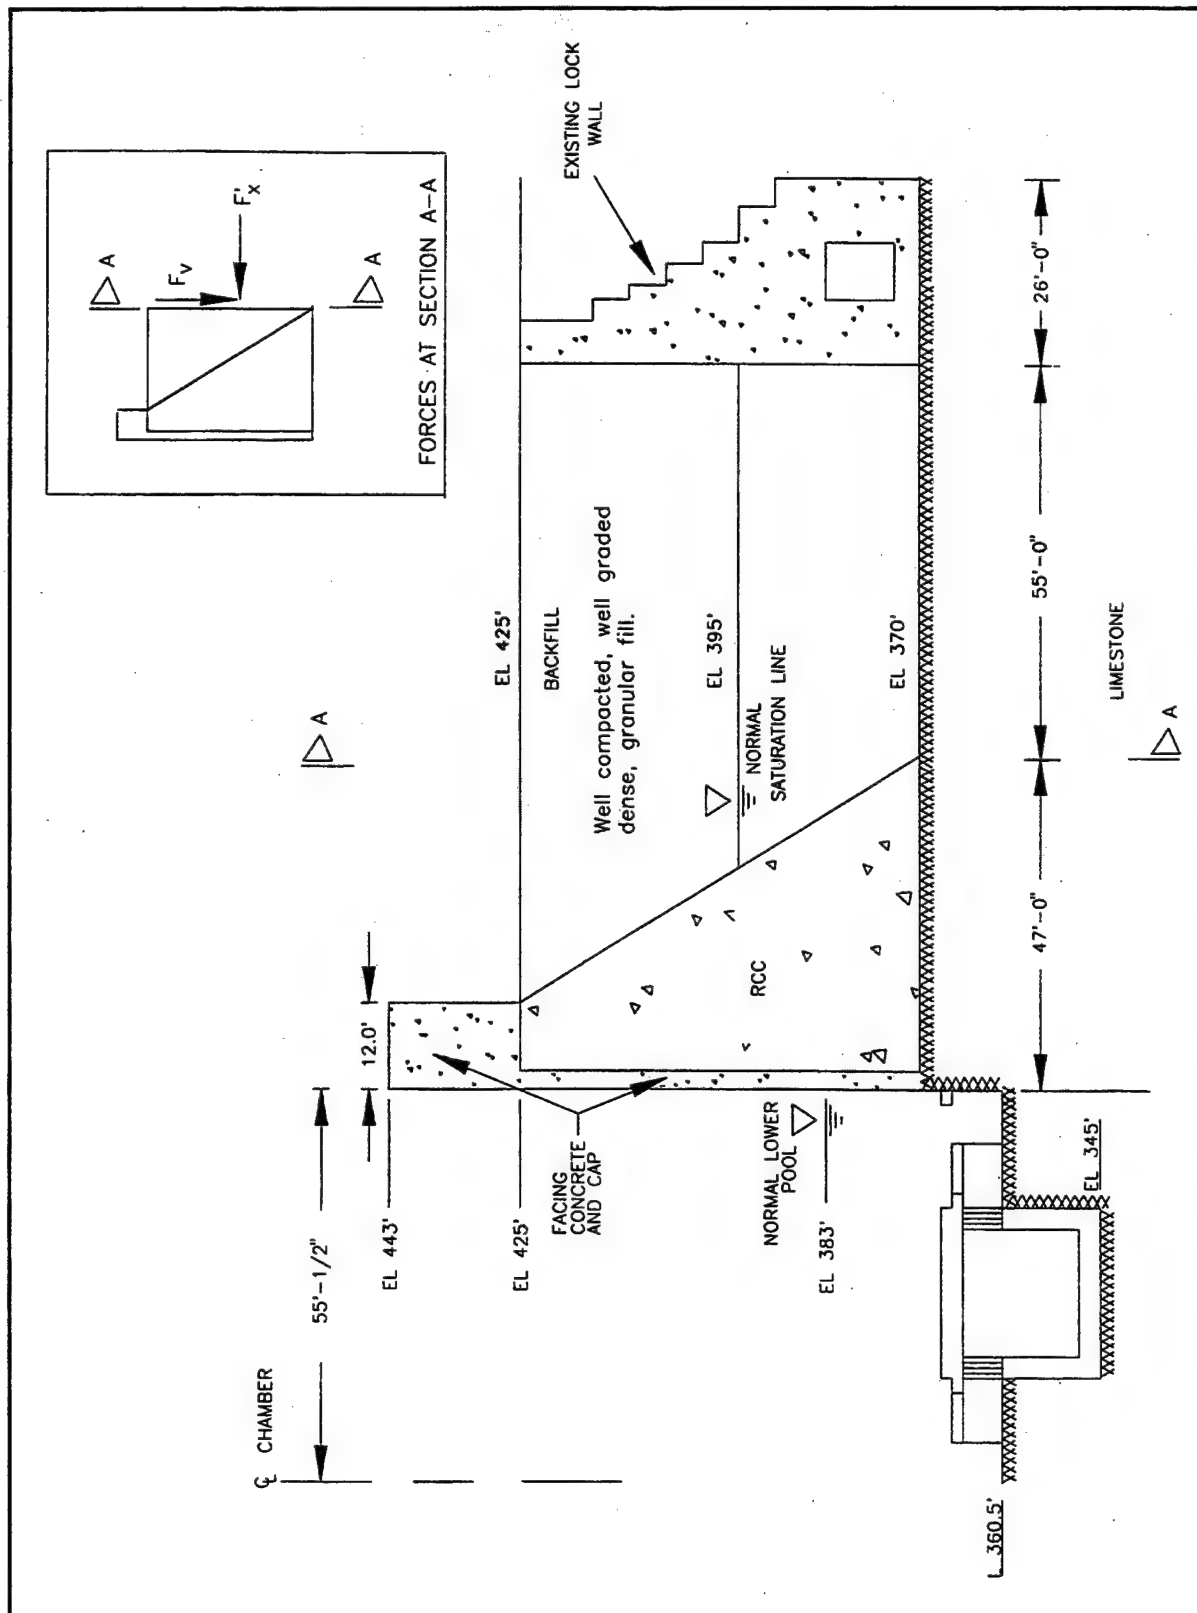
Typical section, north wall of new RCC McAlpine Lock (adapted from Ebeling and Wahl 1997) (1 ft = 0.305 m)
